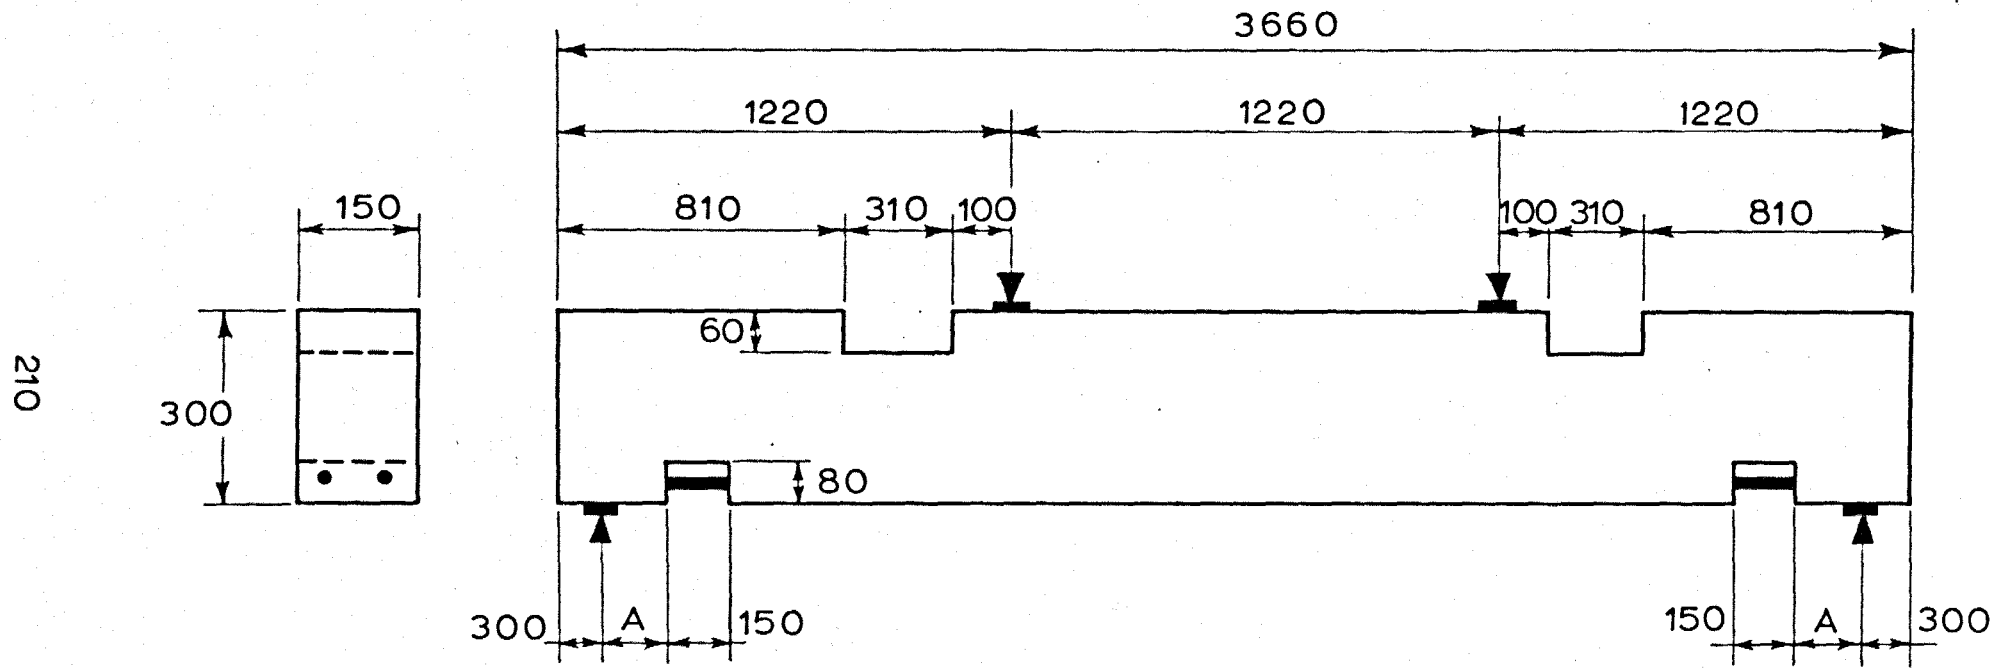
LAYOUT OF BEAMS D1 TO D6
